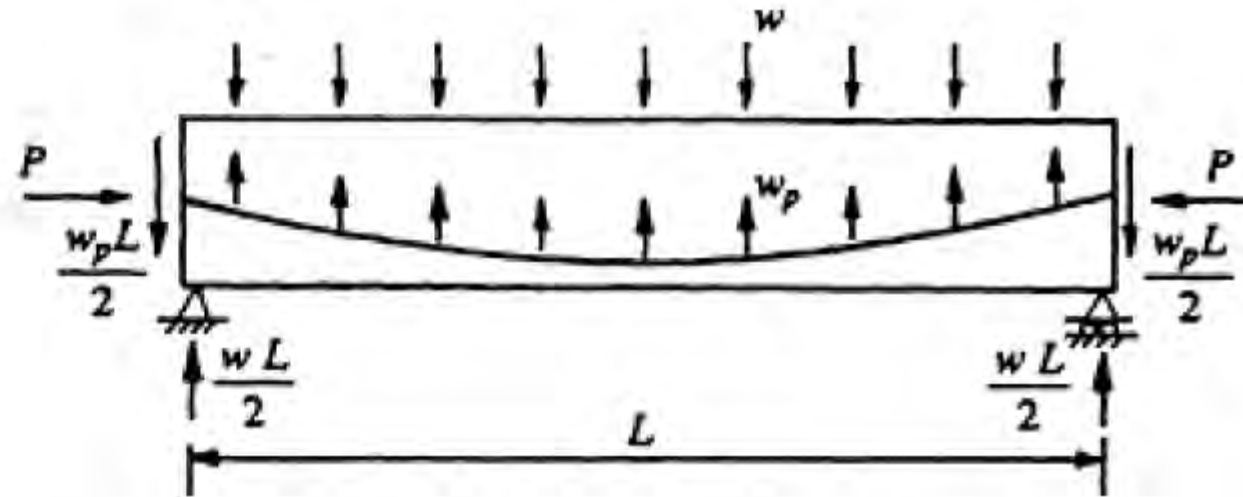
Forces imposed on a concrete beam with a parabolic tendon.
